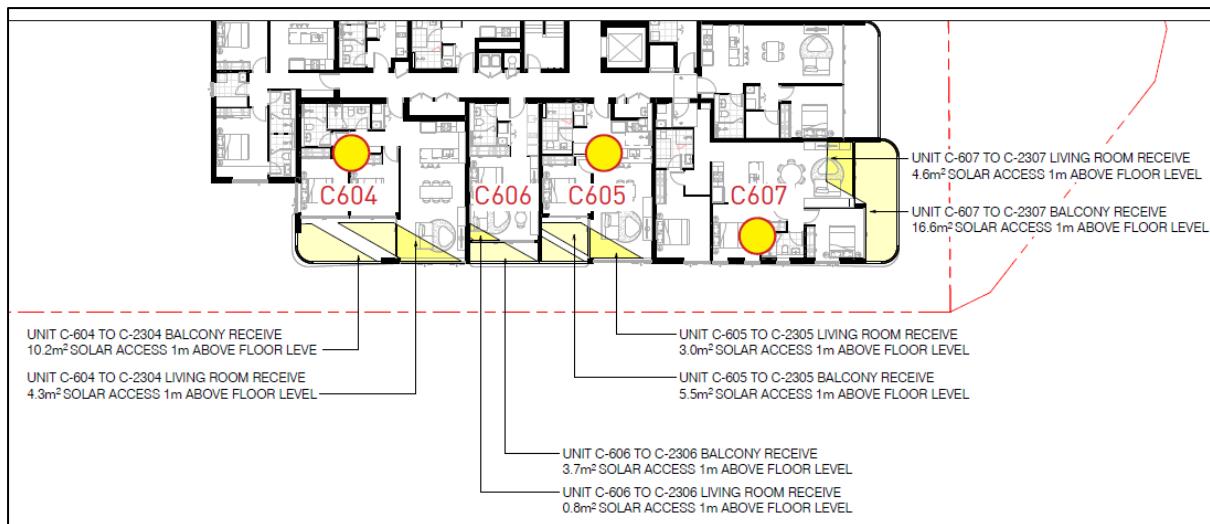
Solar penetration diagram; Building C at 9:15am 21st June (Source: PTW Architects)
